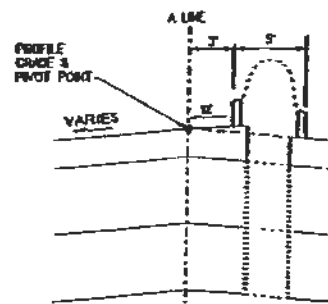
DETAIL DOES NOT APPLY DUE TO SUPERELEVATION
